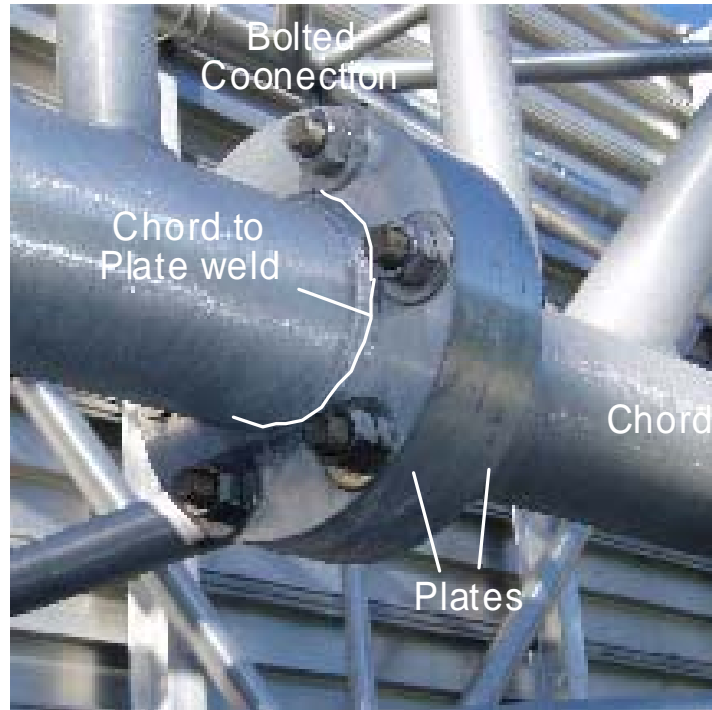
Chord-to-plate weld connection for a box-truss sign structure.
